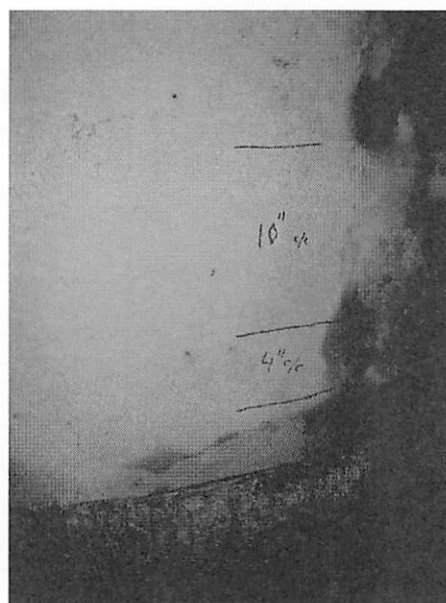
(b) Marking of reinforcement in a column at ground floor of Ban Bhaban
